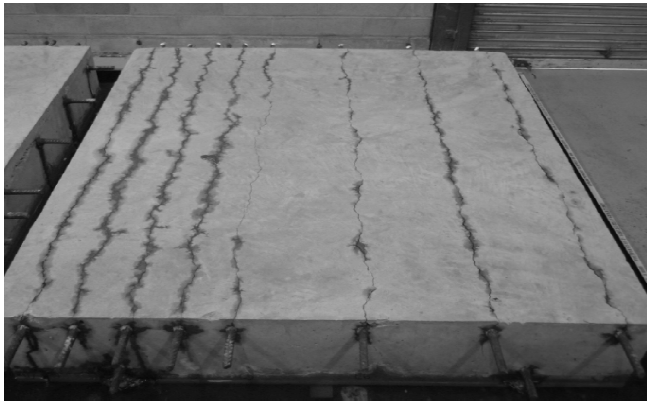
Cracking pattern for concrete cover cracking (one-way reinforcement).
